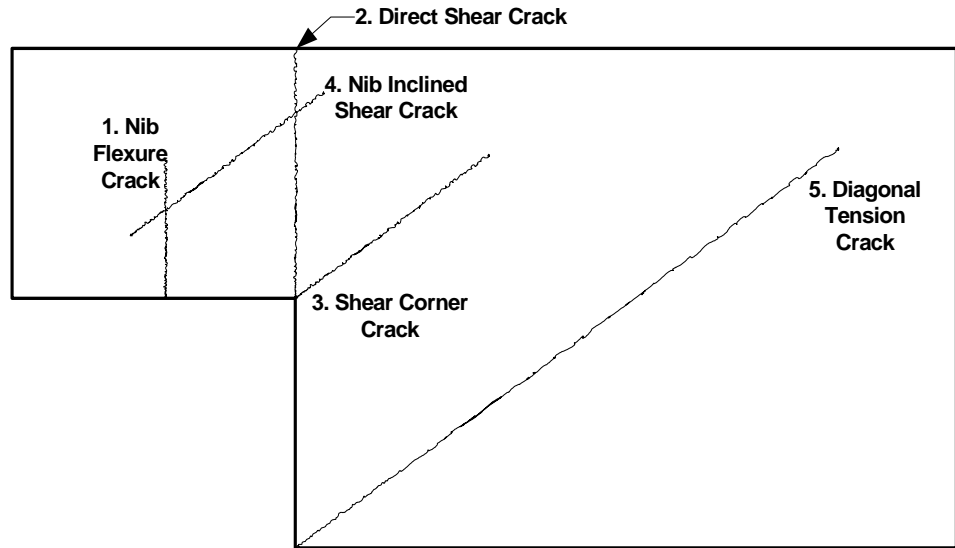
Crack Locations for Dapped End Double Tee Beams
